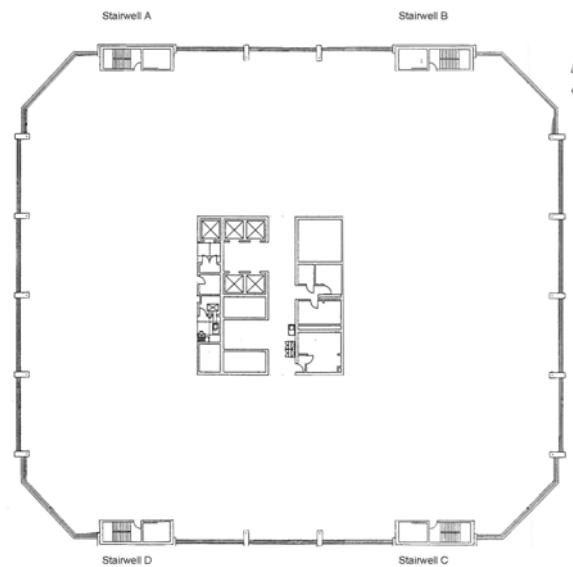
Building layout and stairway location, First Study, Jean Talon building
